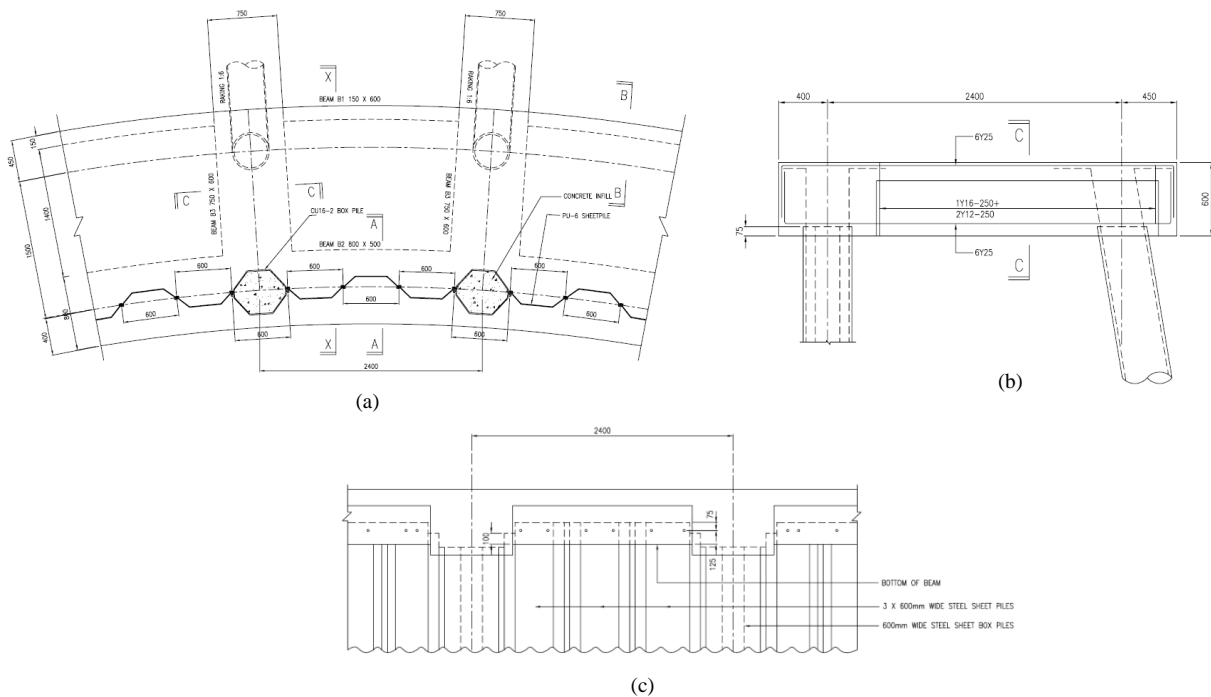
Typical (a) plan, (b) cross-section and (c) front elevation of the proposed riverwall system.
